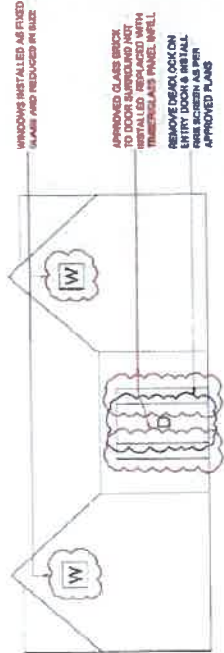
UNIT BLOCK B - WEST ELEVATION
